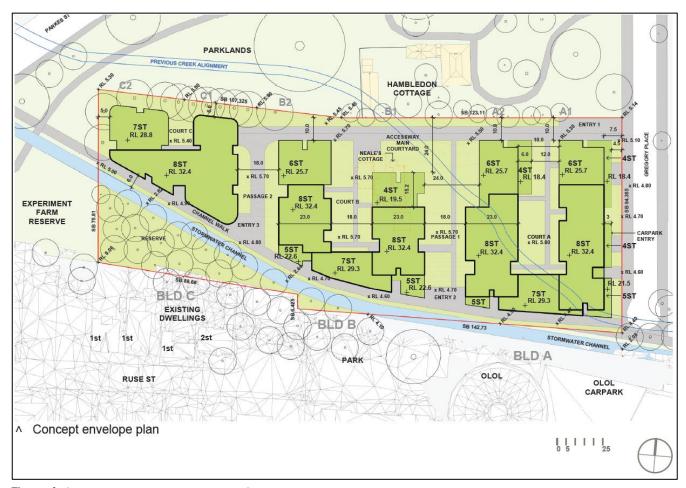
Concept Envelope Plan (source: Stanisic Architects Design Report)
